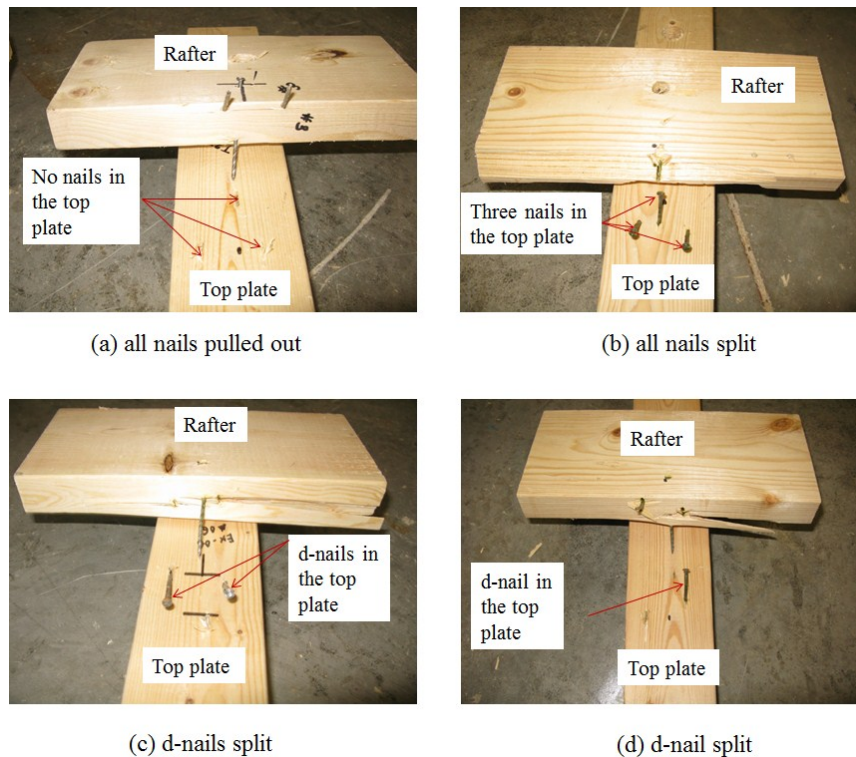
Different types of toe-nail connection failure (s-nail split failure is not shown here)
